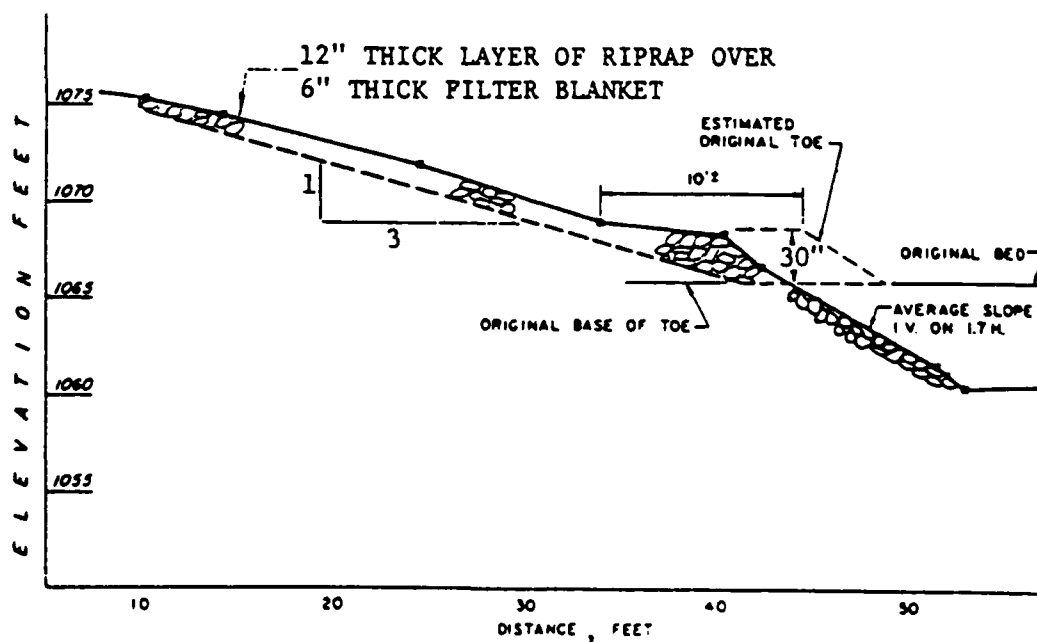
Republican River at Milford Dam Outlet Channel, Kans. Cross-sectional view of Test Section 4 shown as constructed in 1969 and as surveyed in 1974.
